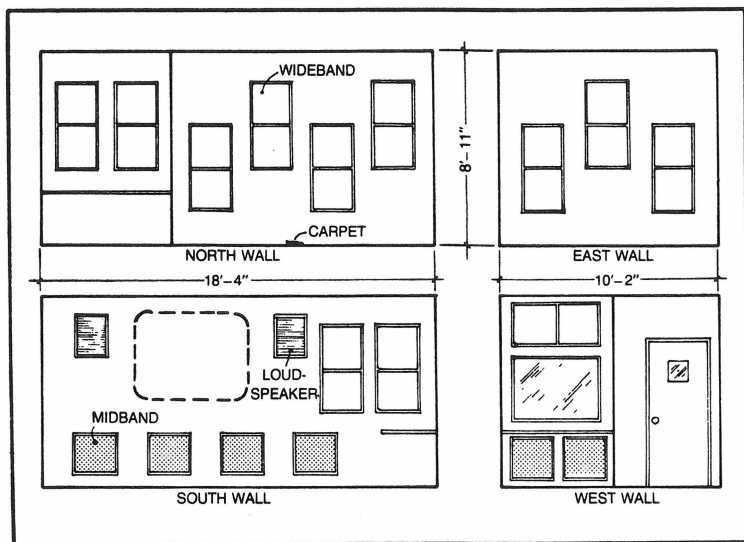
Wall elevations of audiovisual recording studio showing placement of wideband and midband absorbers.
